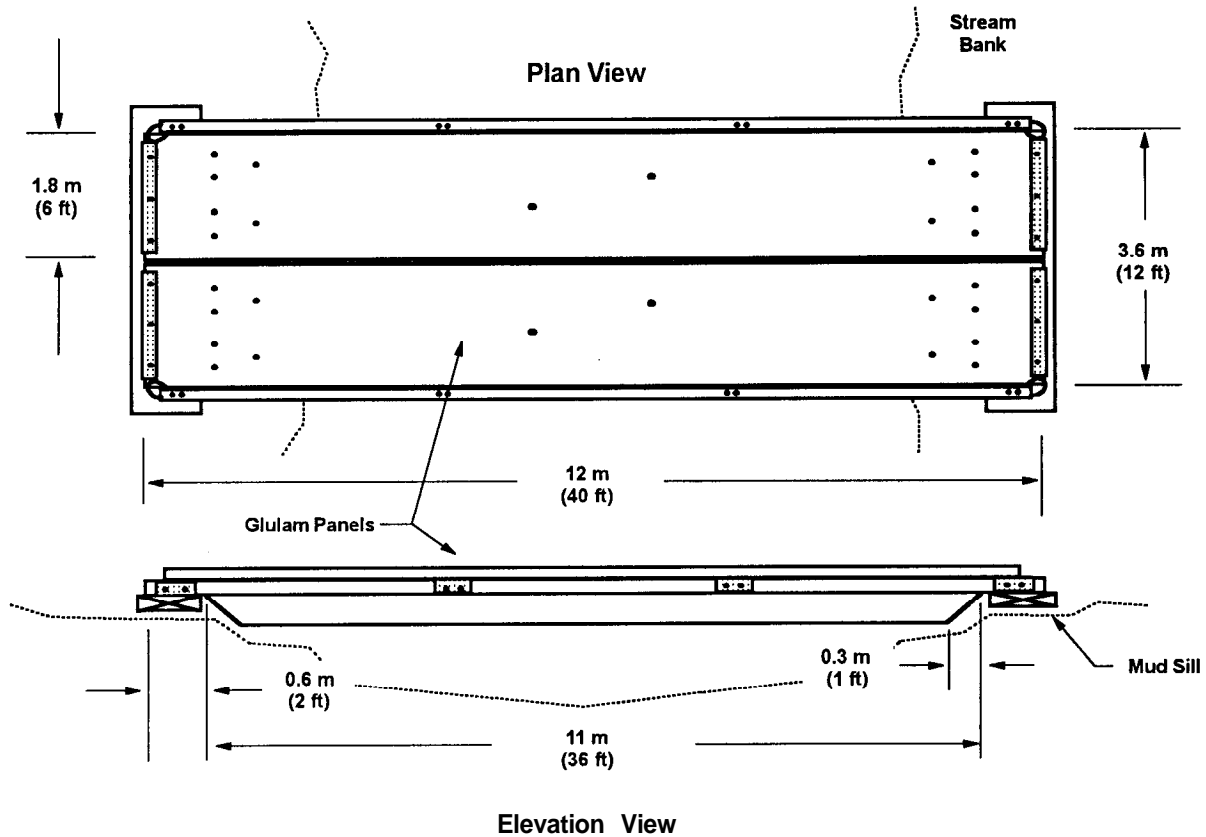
Sketch of bridge installation showing overall dimensions of the portable longitudinal T-section glulam deck bridge.
